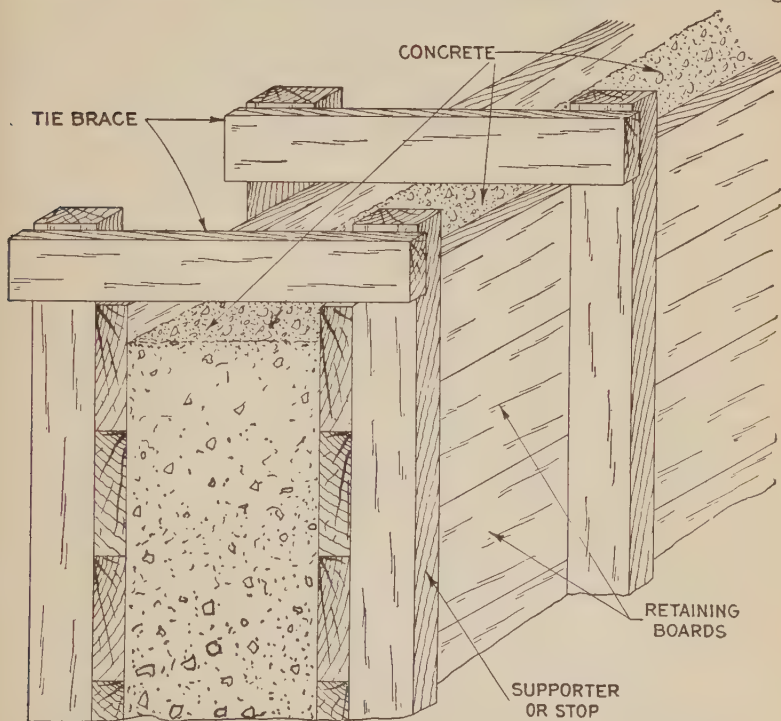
,963.—Elements of a concrete form showing the principal members: retaining board, supporters, braces.
